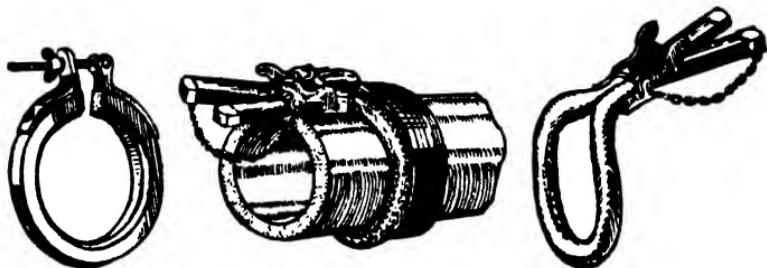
Ring type joint   Fig. 122—Asbestos rope   Fig. 123—Asbestos rope
